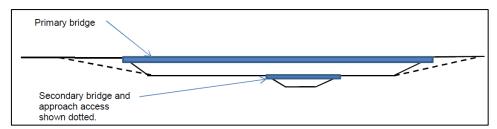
Proposed Primary/Secondary Bridge Crossings
